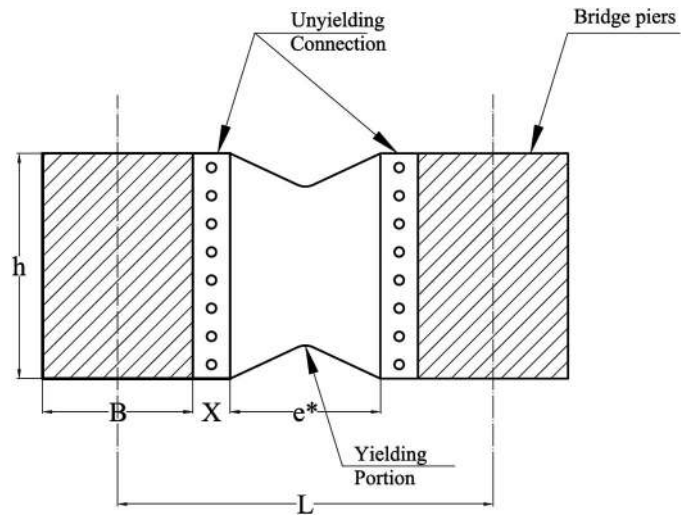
Typical steel plate shear link introduced between two bridge column segments
